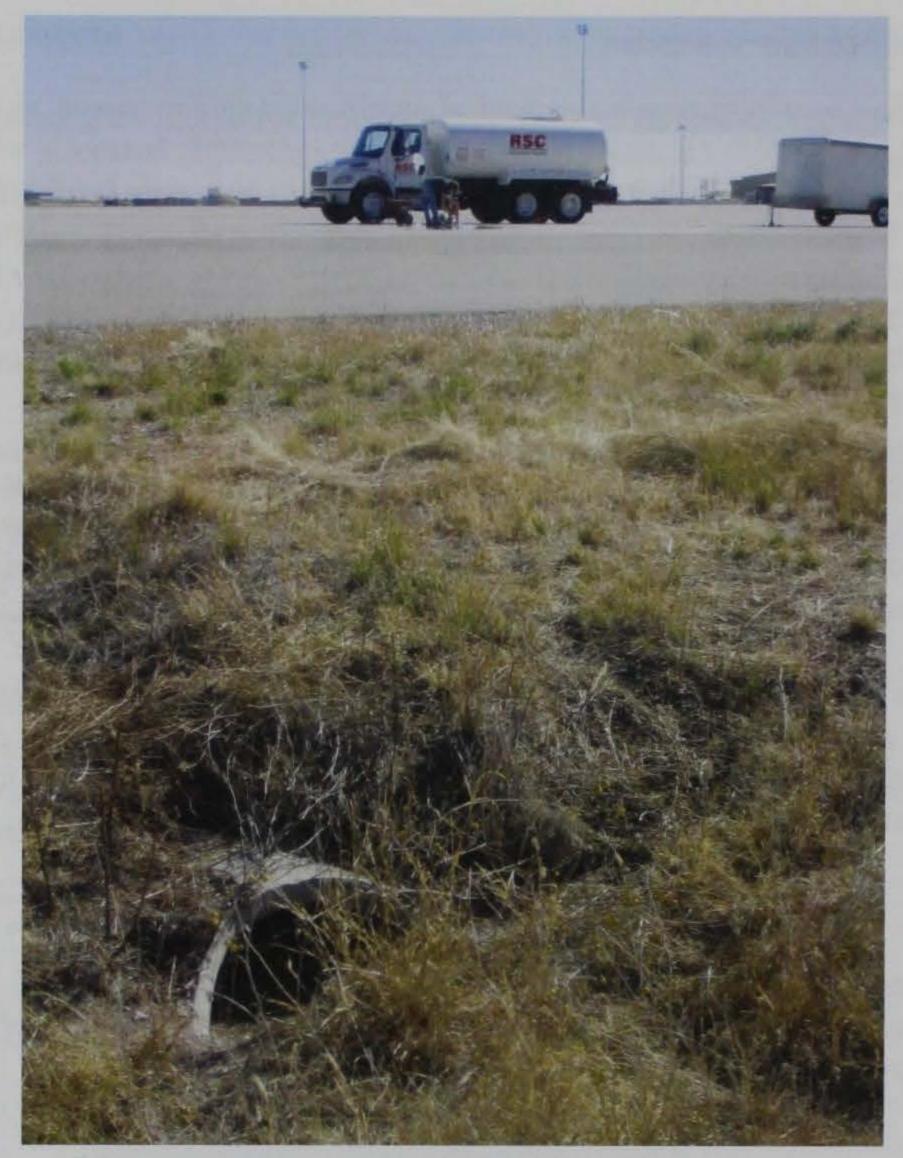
Poorly maintained outlet pipe leading from DAACG Ramp.
